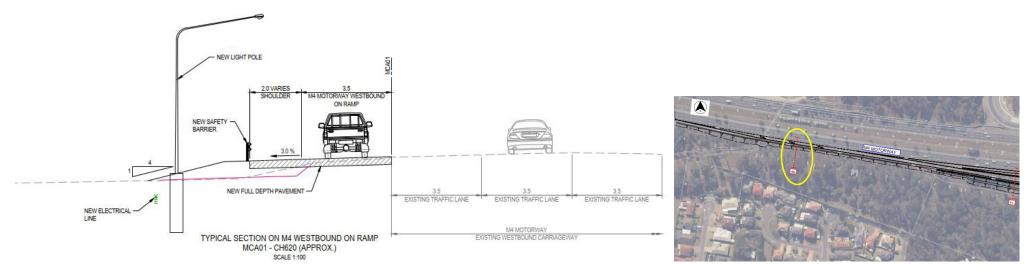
Typical cross section (looking west) on the proposed on-ramp (merge lane)
